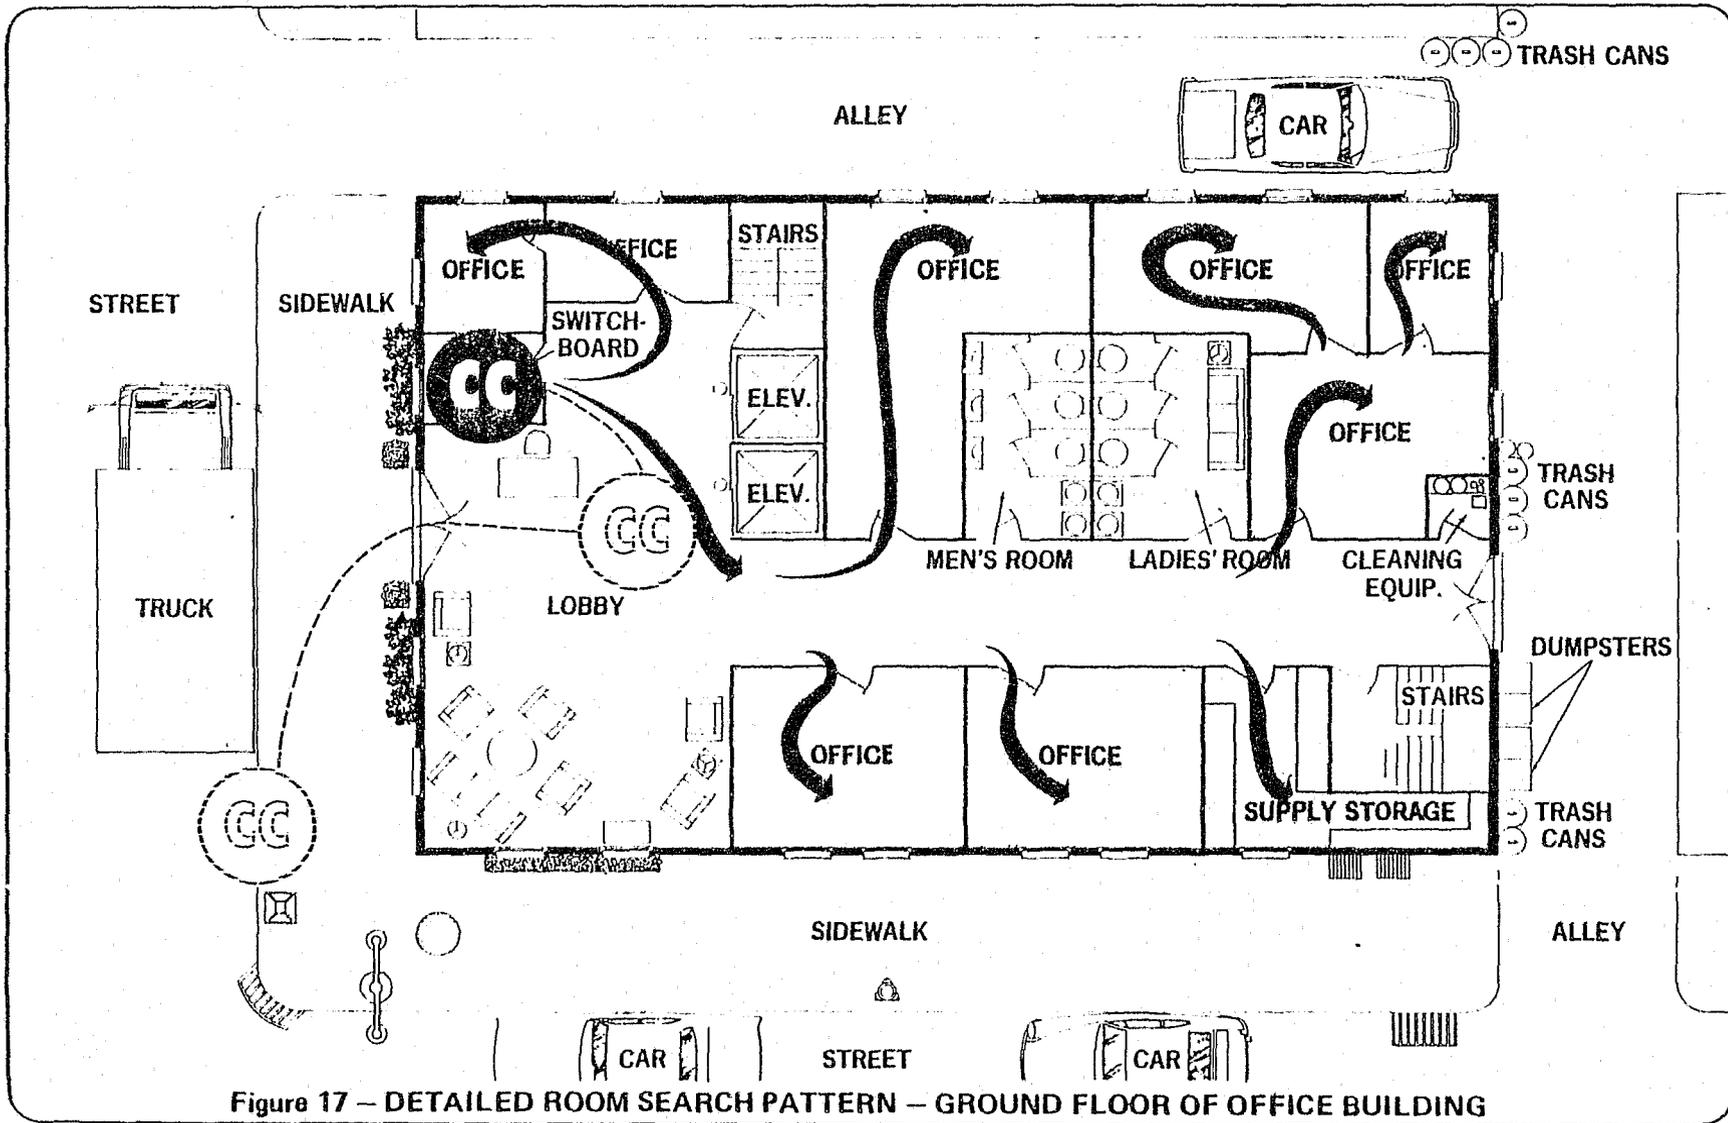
DETAILED ROOM SEARCH PATTERN - GROUND FLOOR OF OFFICE BUILDING
